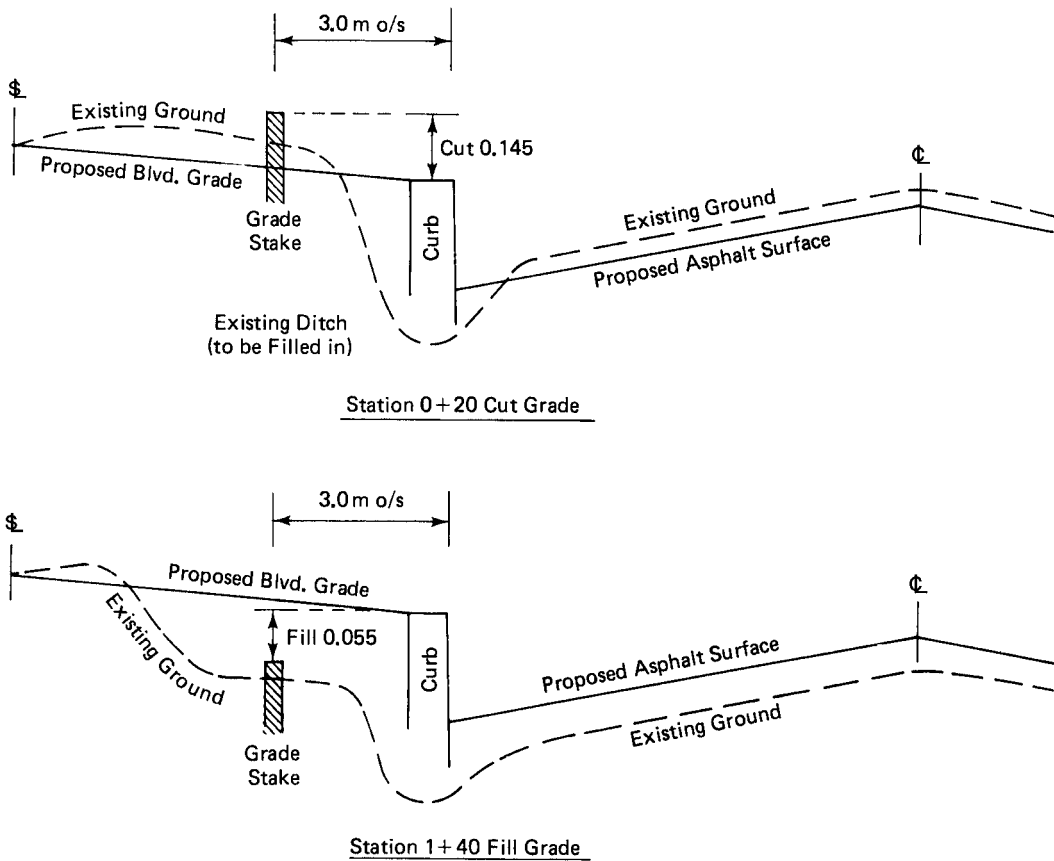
Cross sections showing cut-and-fill grades.
